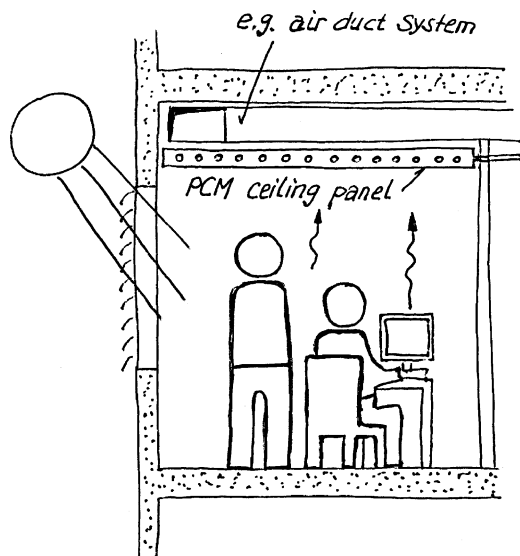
Installation of ceiling panels in building interior as suspended ceiling.
